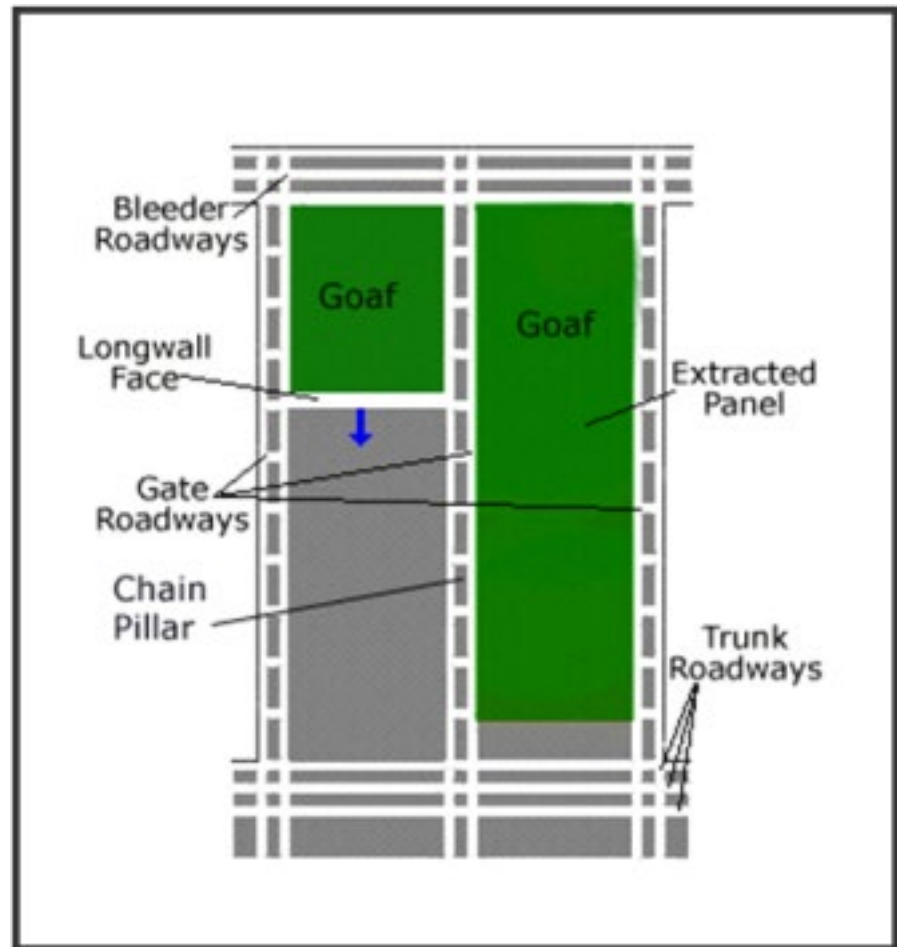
Long wall panel layout with chain pillar (Source: University of Wollongong)
